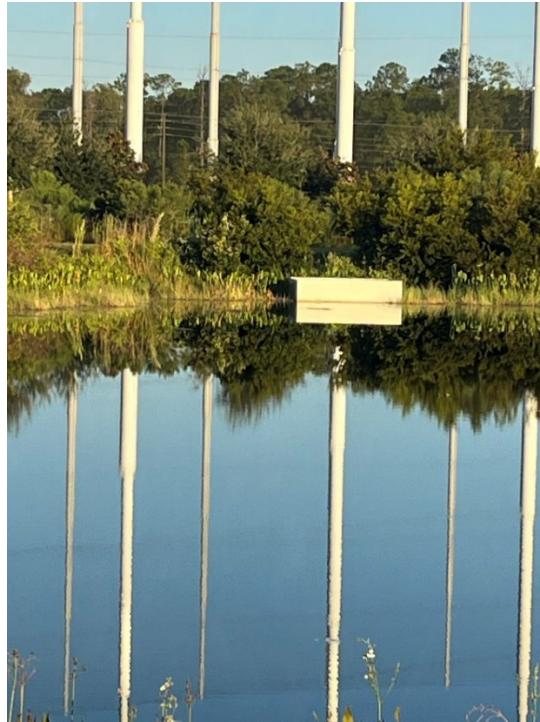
Outfall Structure View from South Side of Pond Looking NW in Good Condition
